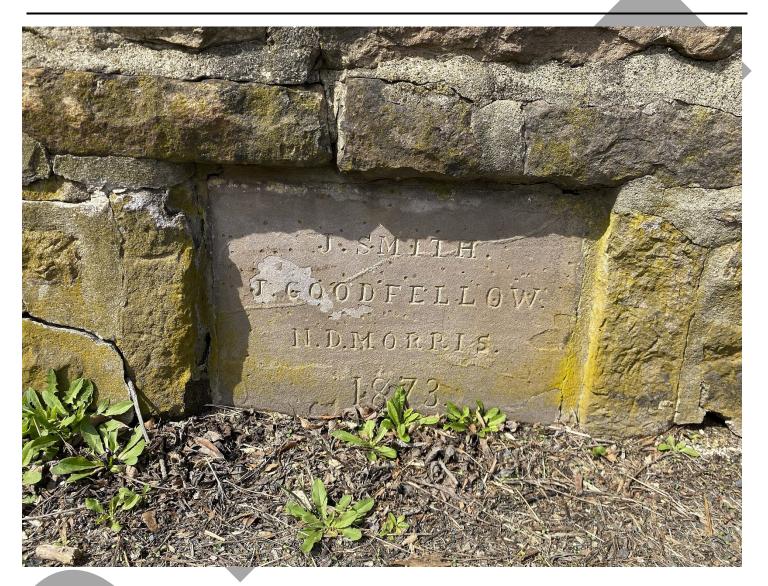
Datestone, Inside face of the west (upstream) parapet. View facing west.
